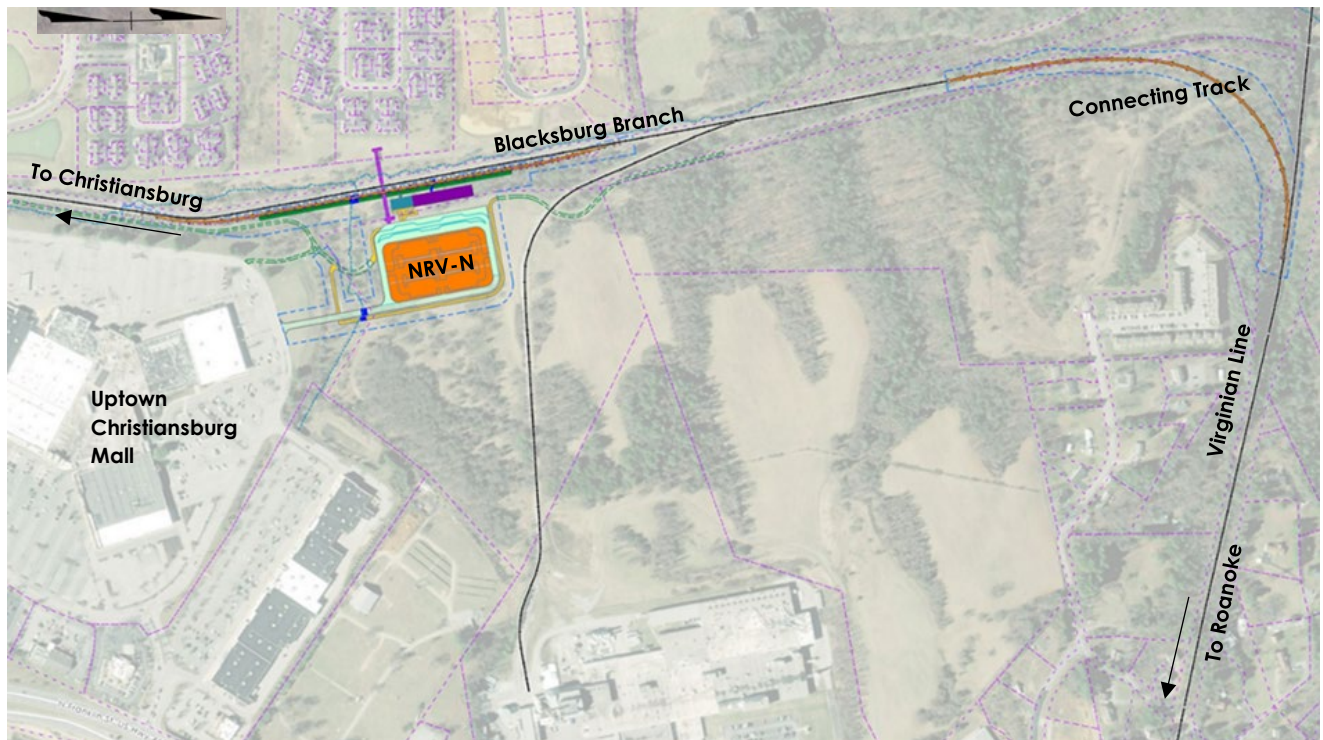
CONNECTING TRACK TO BLACKSBURG BRANCH
